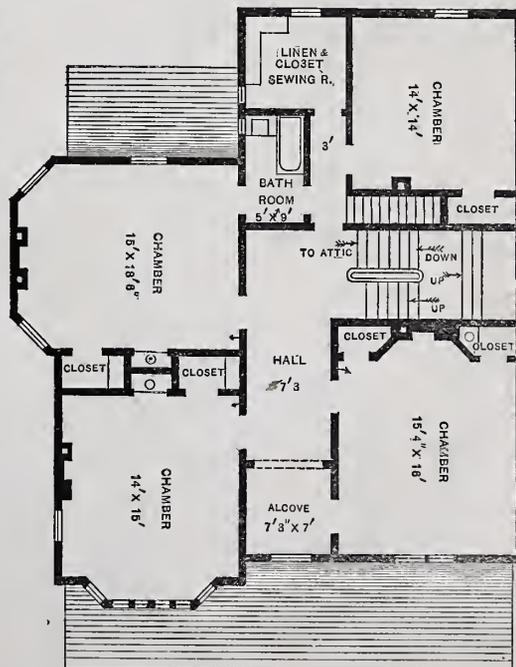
Second Floor Plan.—Scale, 1-16 Inch to the Foot.
